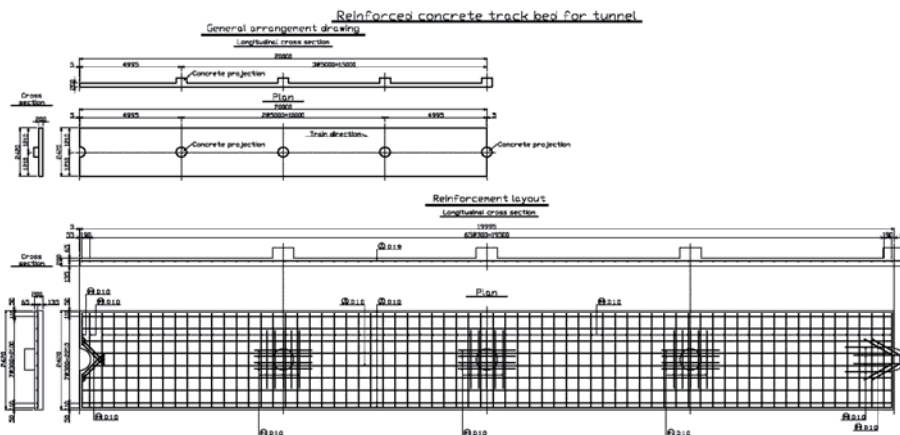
Reinforced Concrete Track bed (Tunnel Section)
